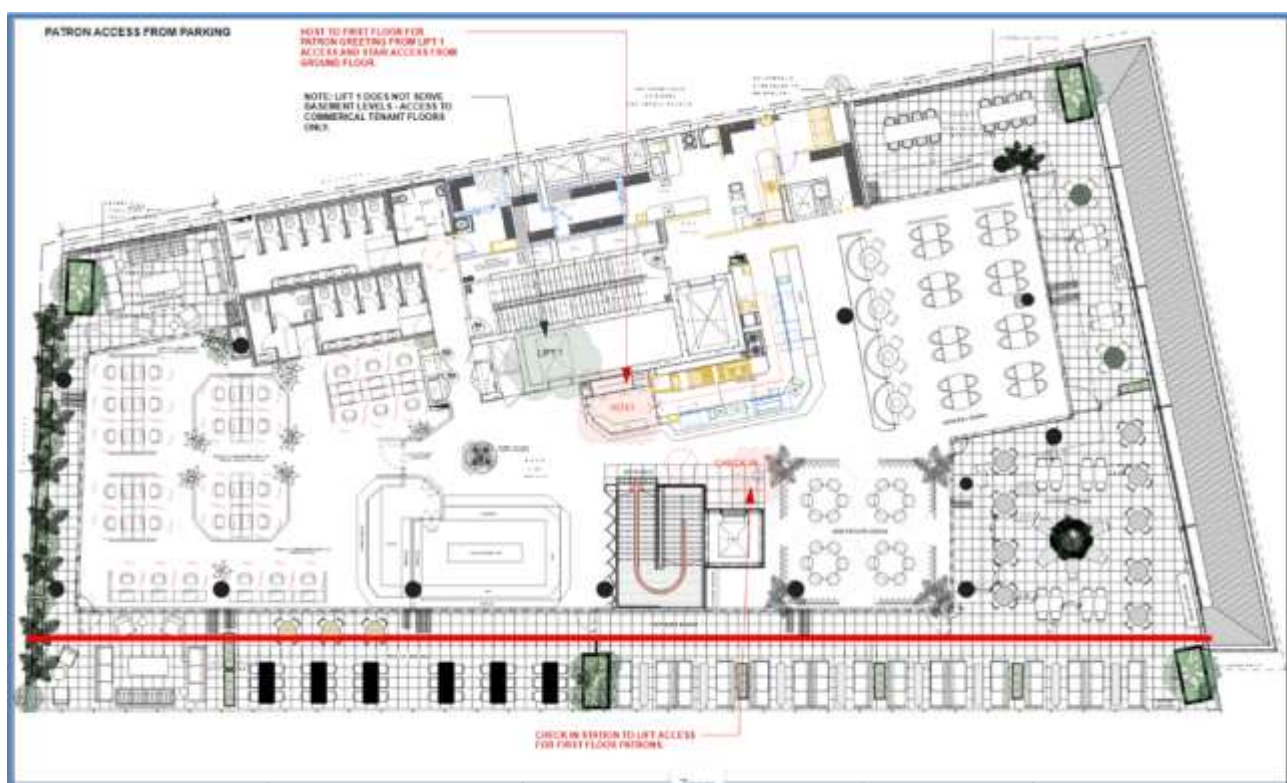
Floor plan of level 1 outdoor terrace, with western boundary shown in red.
